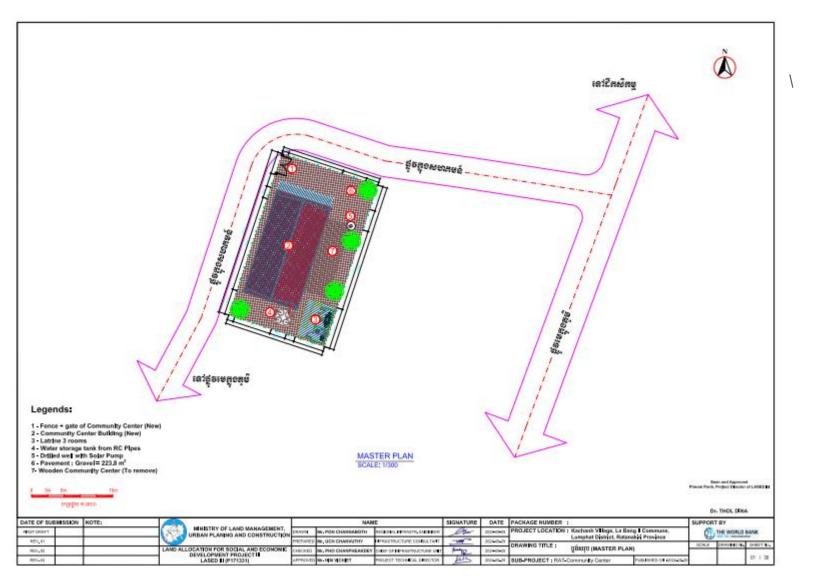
Master Plan for one new Community Center building construction under the LASED III Finance Support in Kachanh Village
